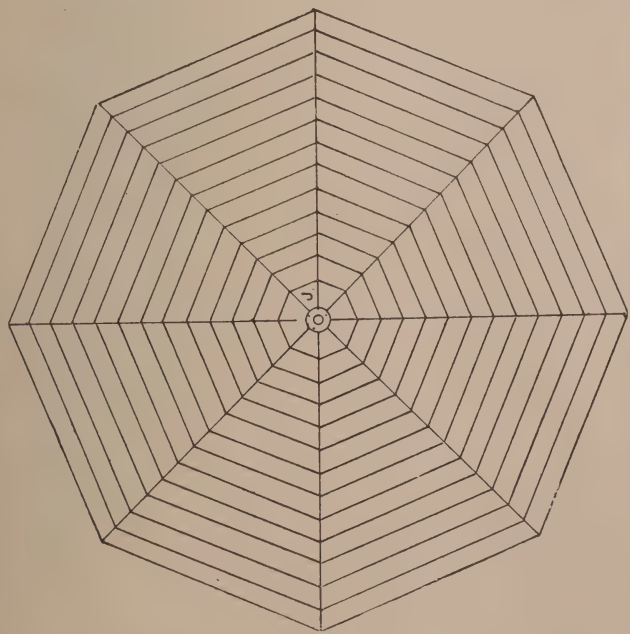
Plan of Octagonal Wood Floor for Bell Tent
